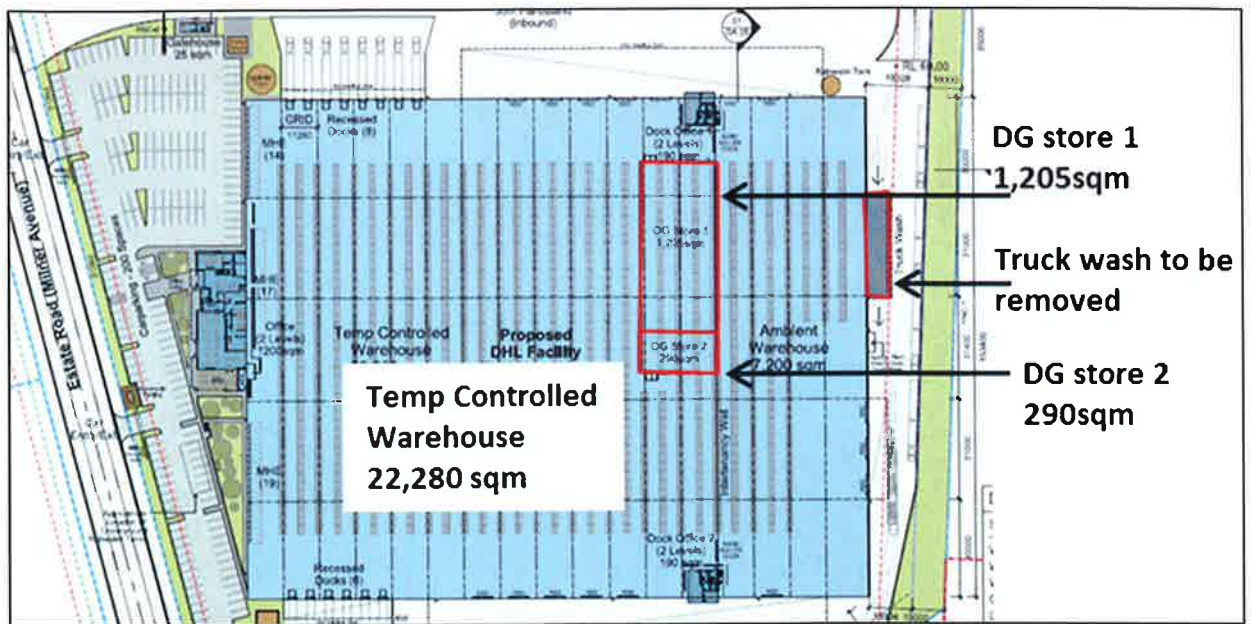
Approved layout of Unit 2B for proposed DHL Facility
